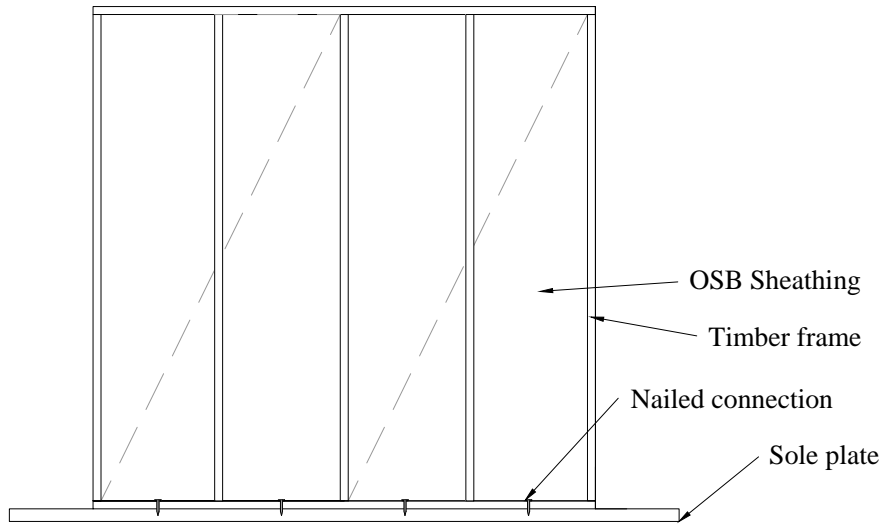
Illustration of a partially anchored wall. Bottom rail is anchored using a nailed connection between each stud. Unlike in Figure 2-3, the end studs are not directly anchored.
